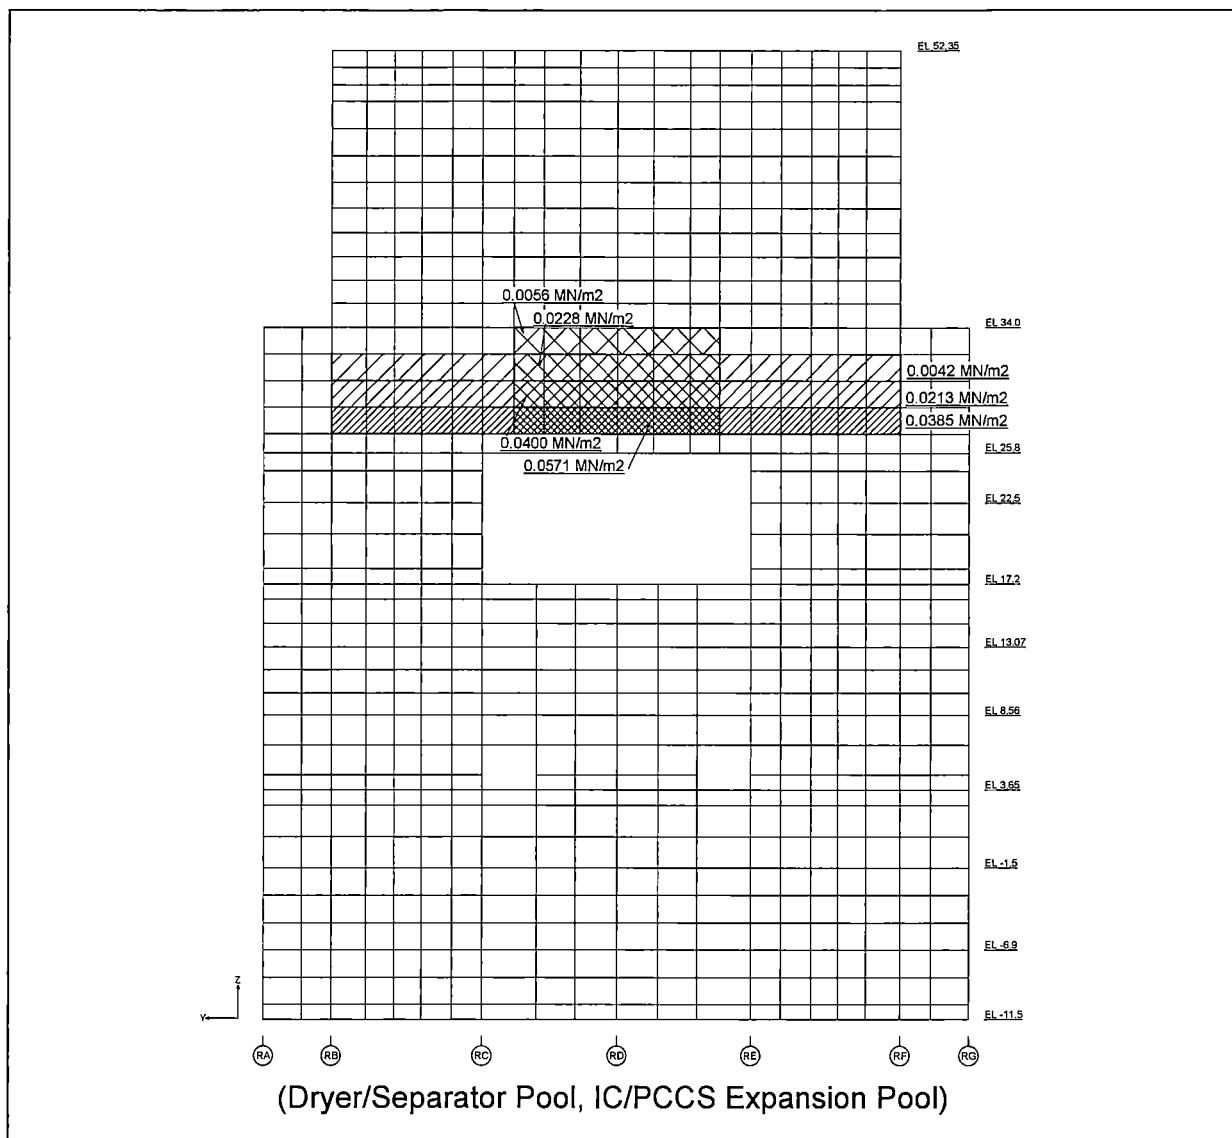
Hydrostatic Loads on the R1 External Wall
